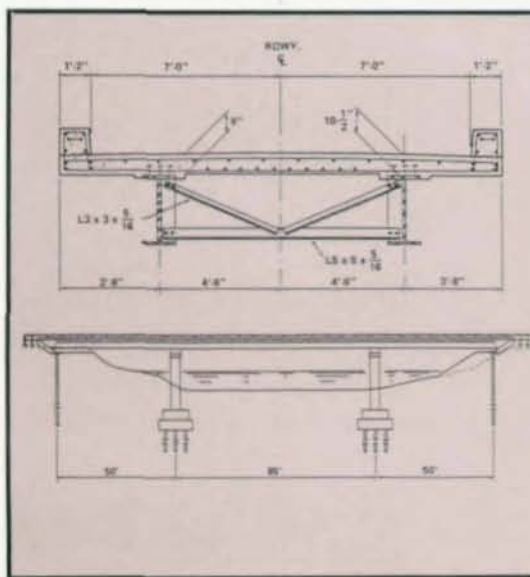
Elev. of Whitechuck Bridge (top); cross section
